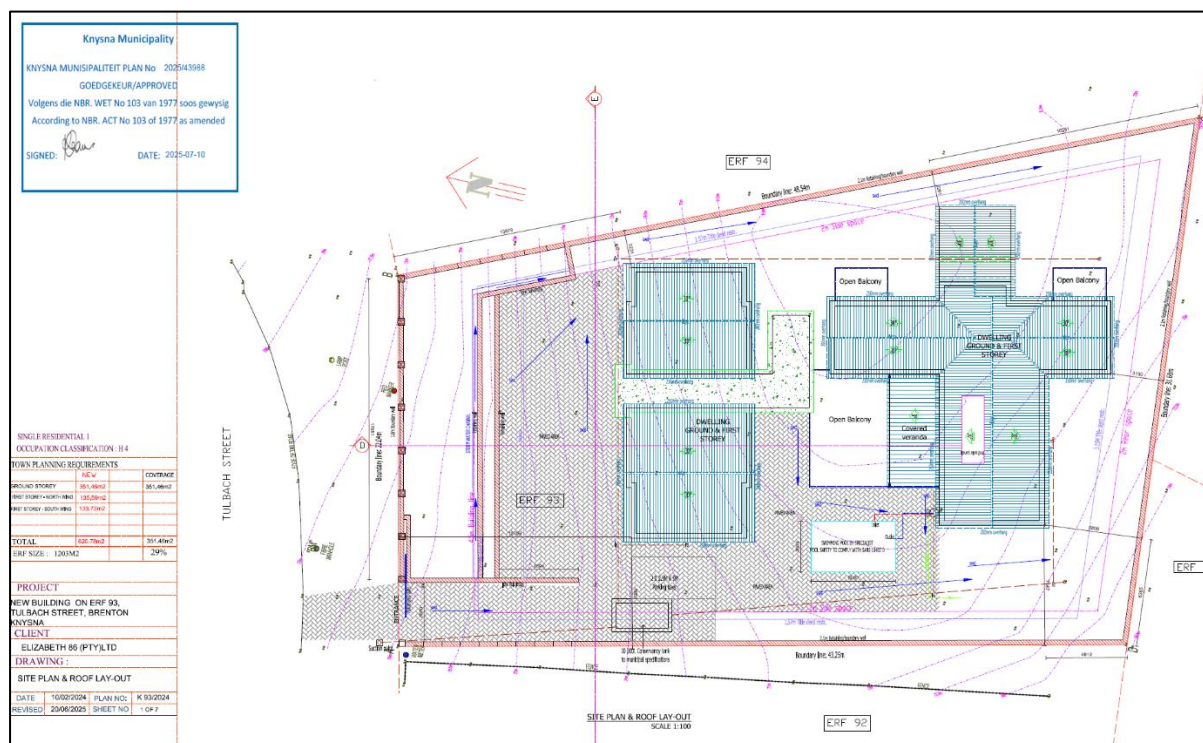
EXTRACT FROM THE APPROVED BUILDING PLANS
